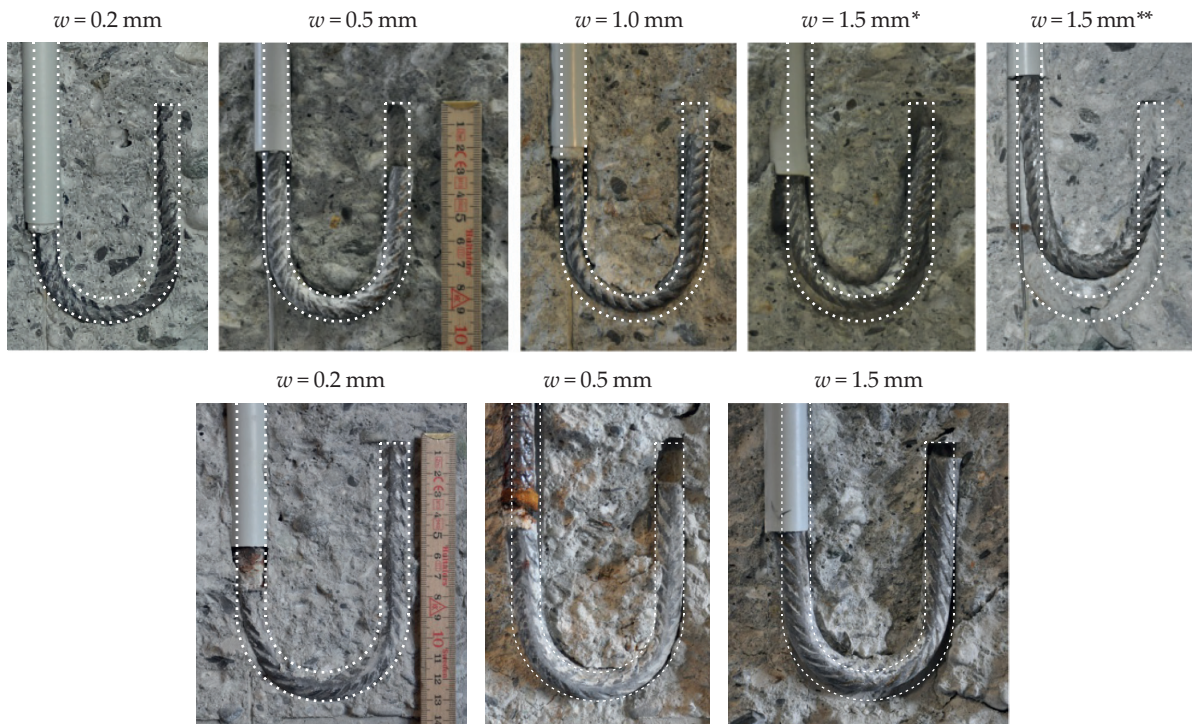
Saw-cuts performed after test in specimens *SB11* (up, $d_b=10$ mm) and *SB12* (down, $d_b=14$ mm) with deformed hooks disposed parallel to cracks (dashed line for initial position and geometry of the detail)
